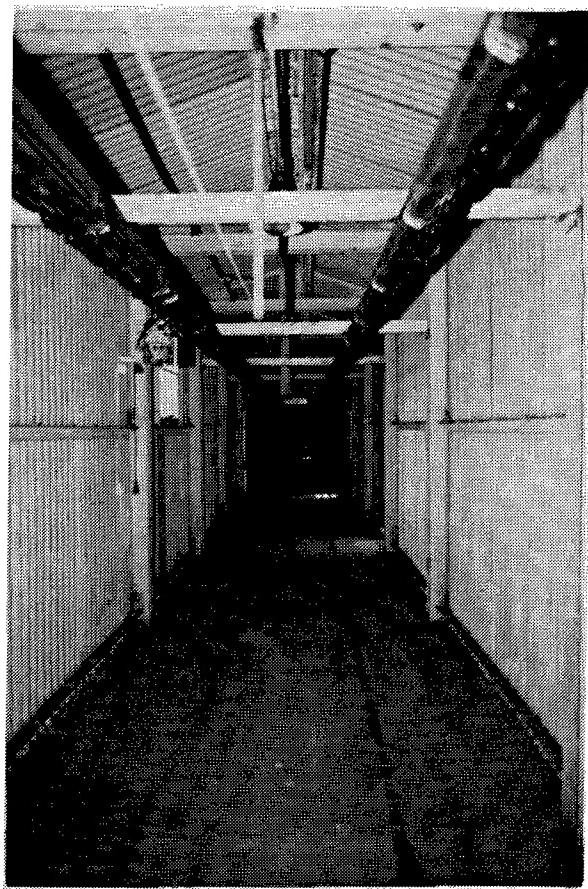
Corridor between Packing and Shipping Building (Building CA-13) and a Propellant Charge Building (Building CA-14).
